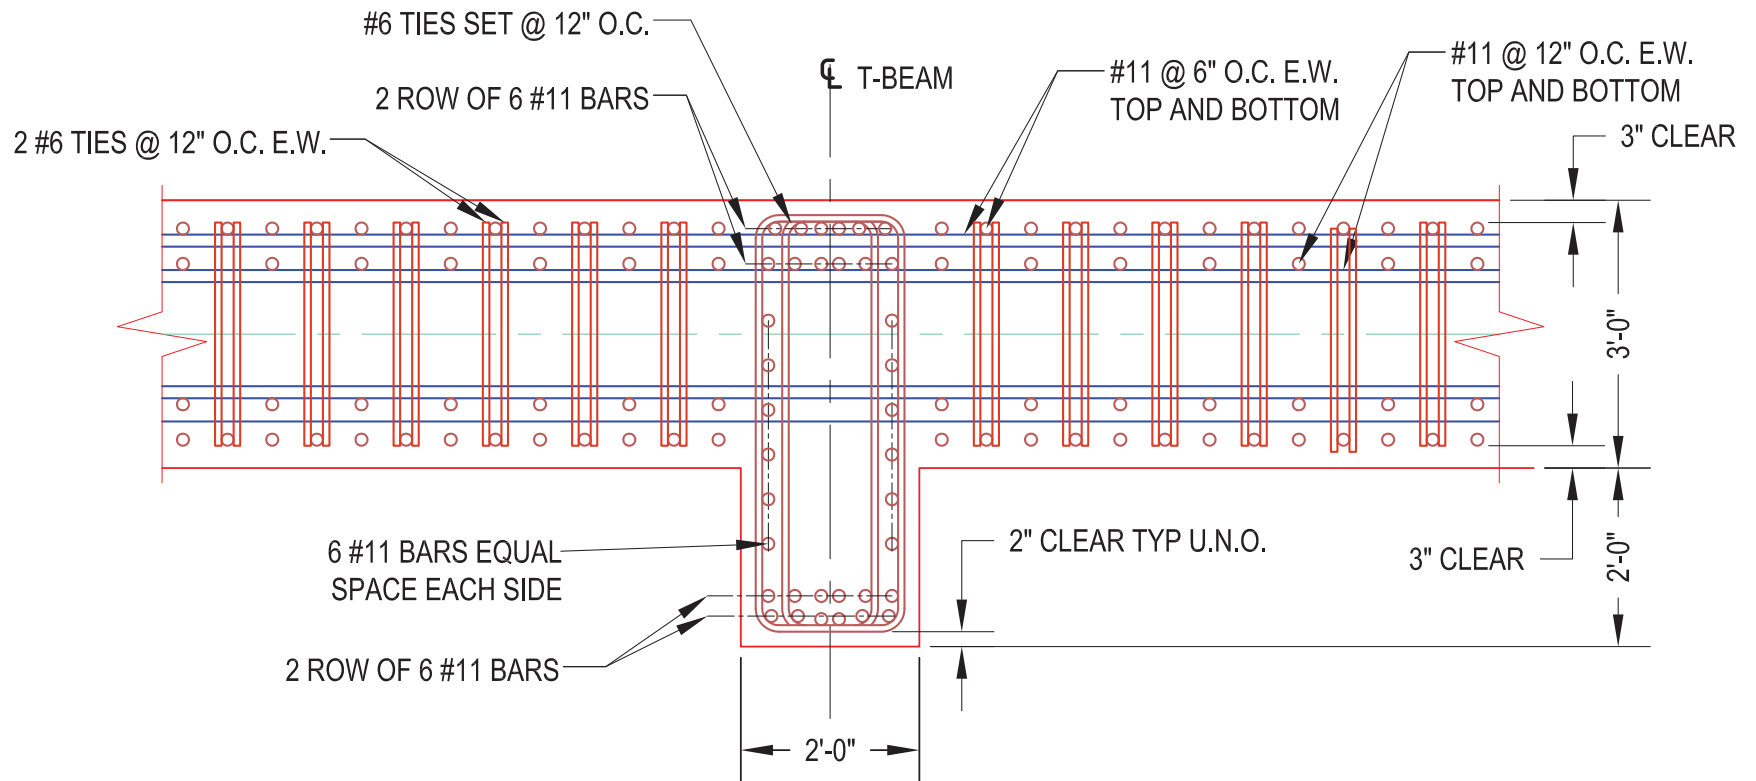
B-38: RXB Reinforcement Detail for Type 1 T-Beams at EL 75'-0"
